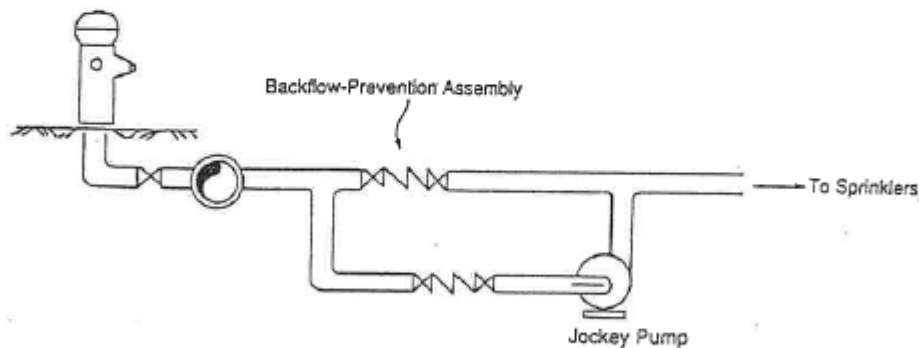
Supply for jockey pump; upstream of backflow-prevention assembly on main supply line.
